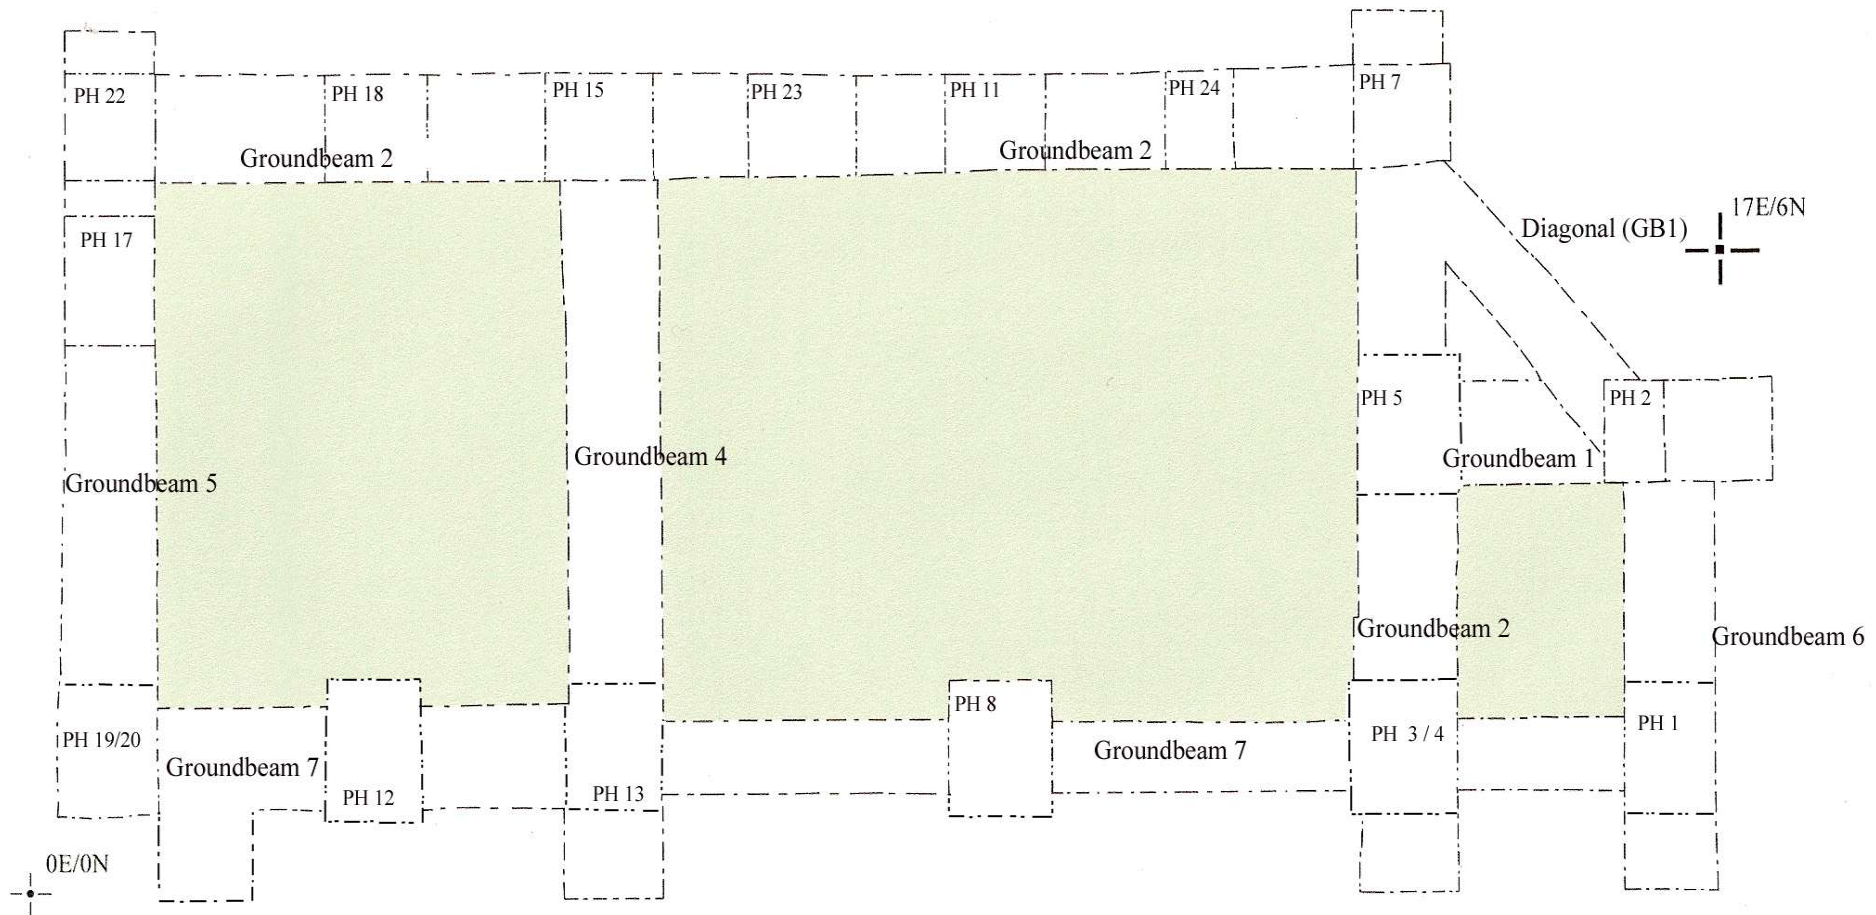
The final foundation redesign removing two lateral groundbeams and relocating piles and identifying areas of preservation *in situ* shown in green. (not to scale, north is at the top of the figure).
